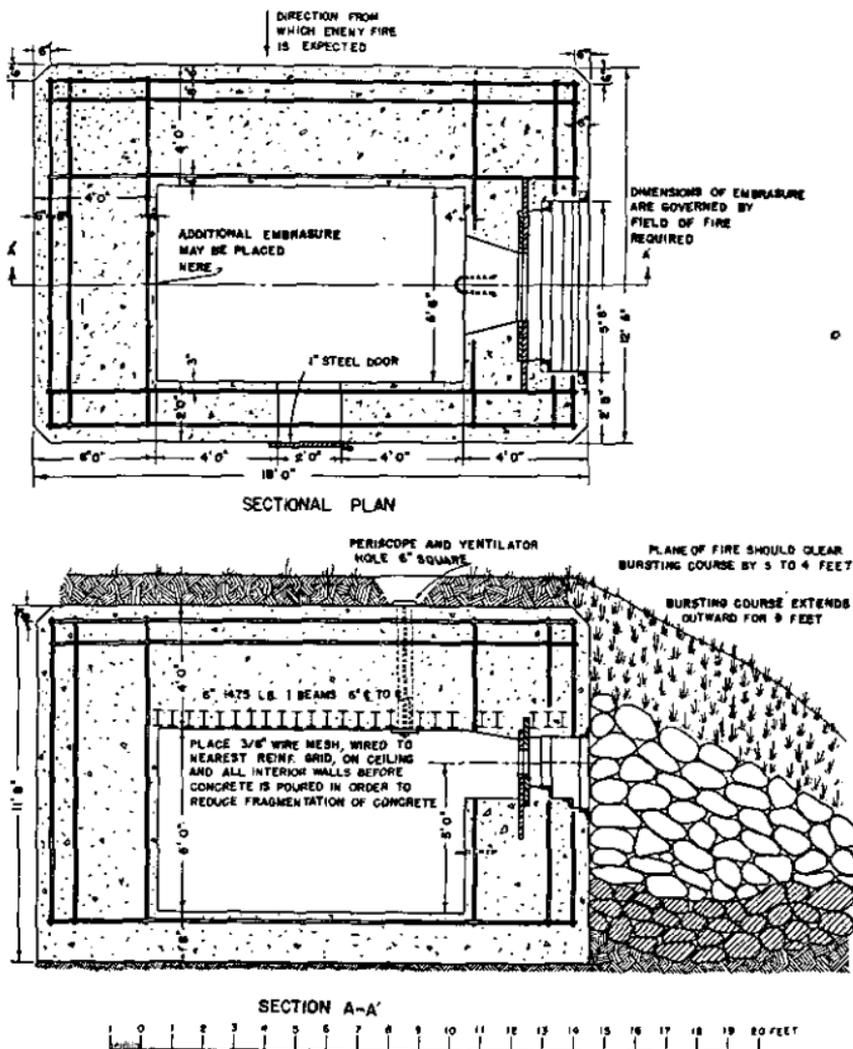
Sectional plan and elevation, light shellproof machine-gun emplacement.
